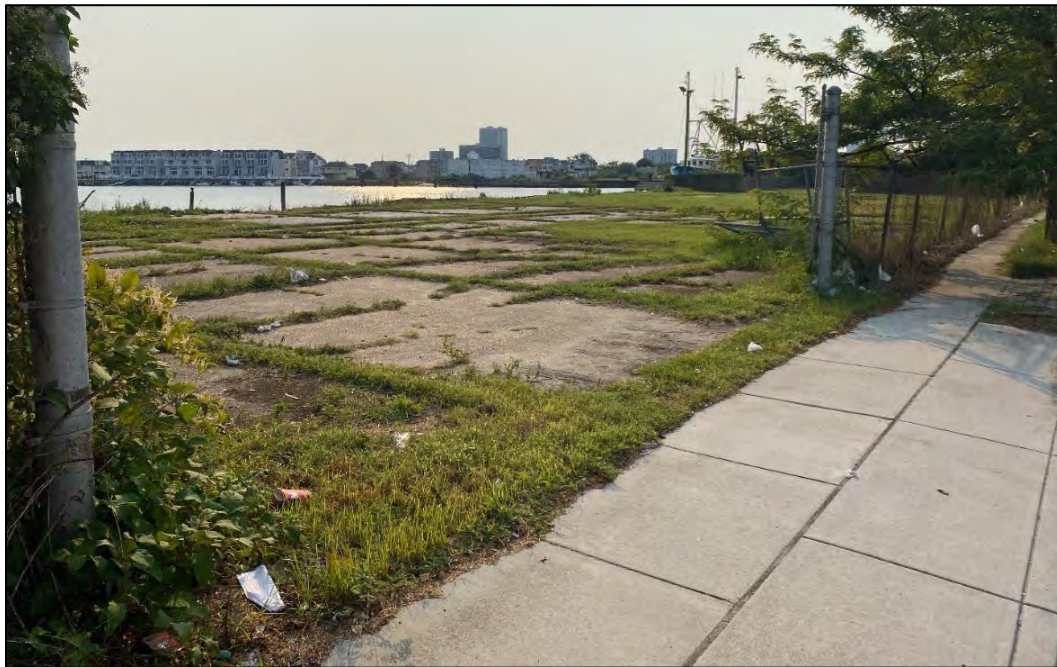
Overview of the southern portion of the proposed Facility Site, enclosed in a concrete wall with roughly octagonal concrete foundation pads. View to the north.
